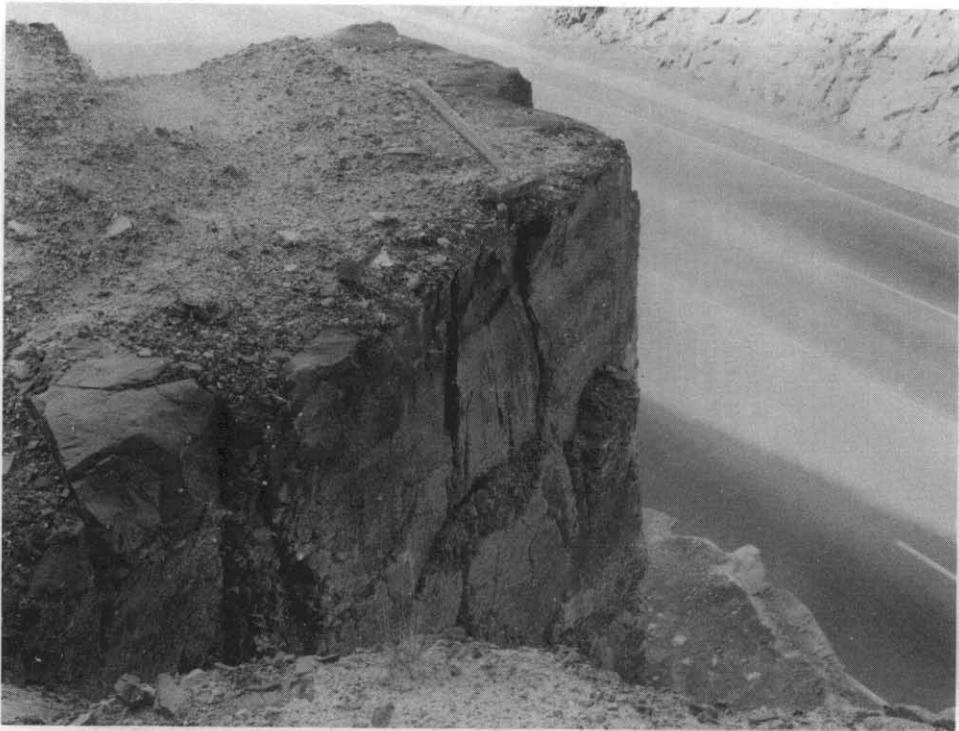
Tunnel Hill cutting. Vertical joints opening due to load relaxation.
